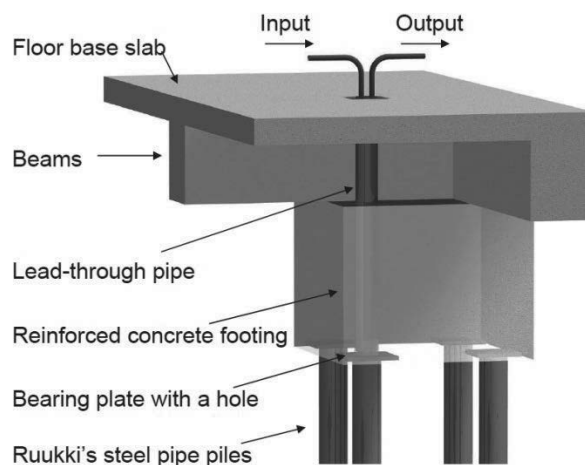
Loops of energy collecting components are installed inside of a steel pipe pile.
